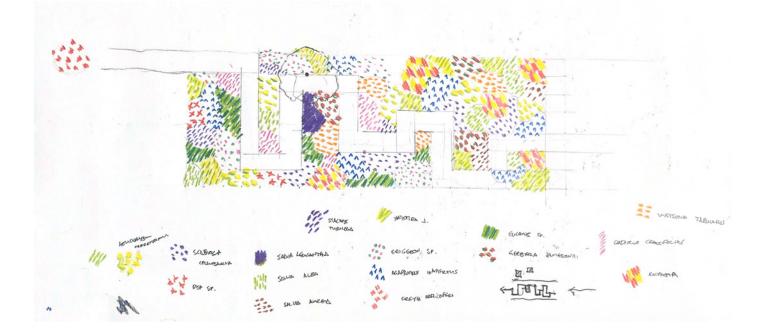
Detail planting design layout for western manor house landscape, author, 2022.
